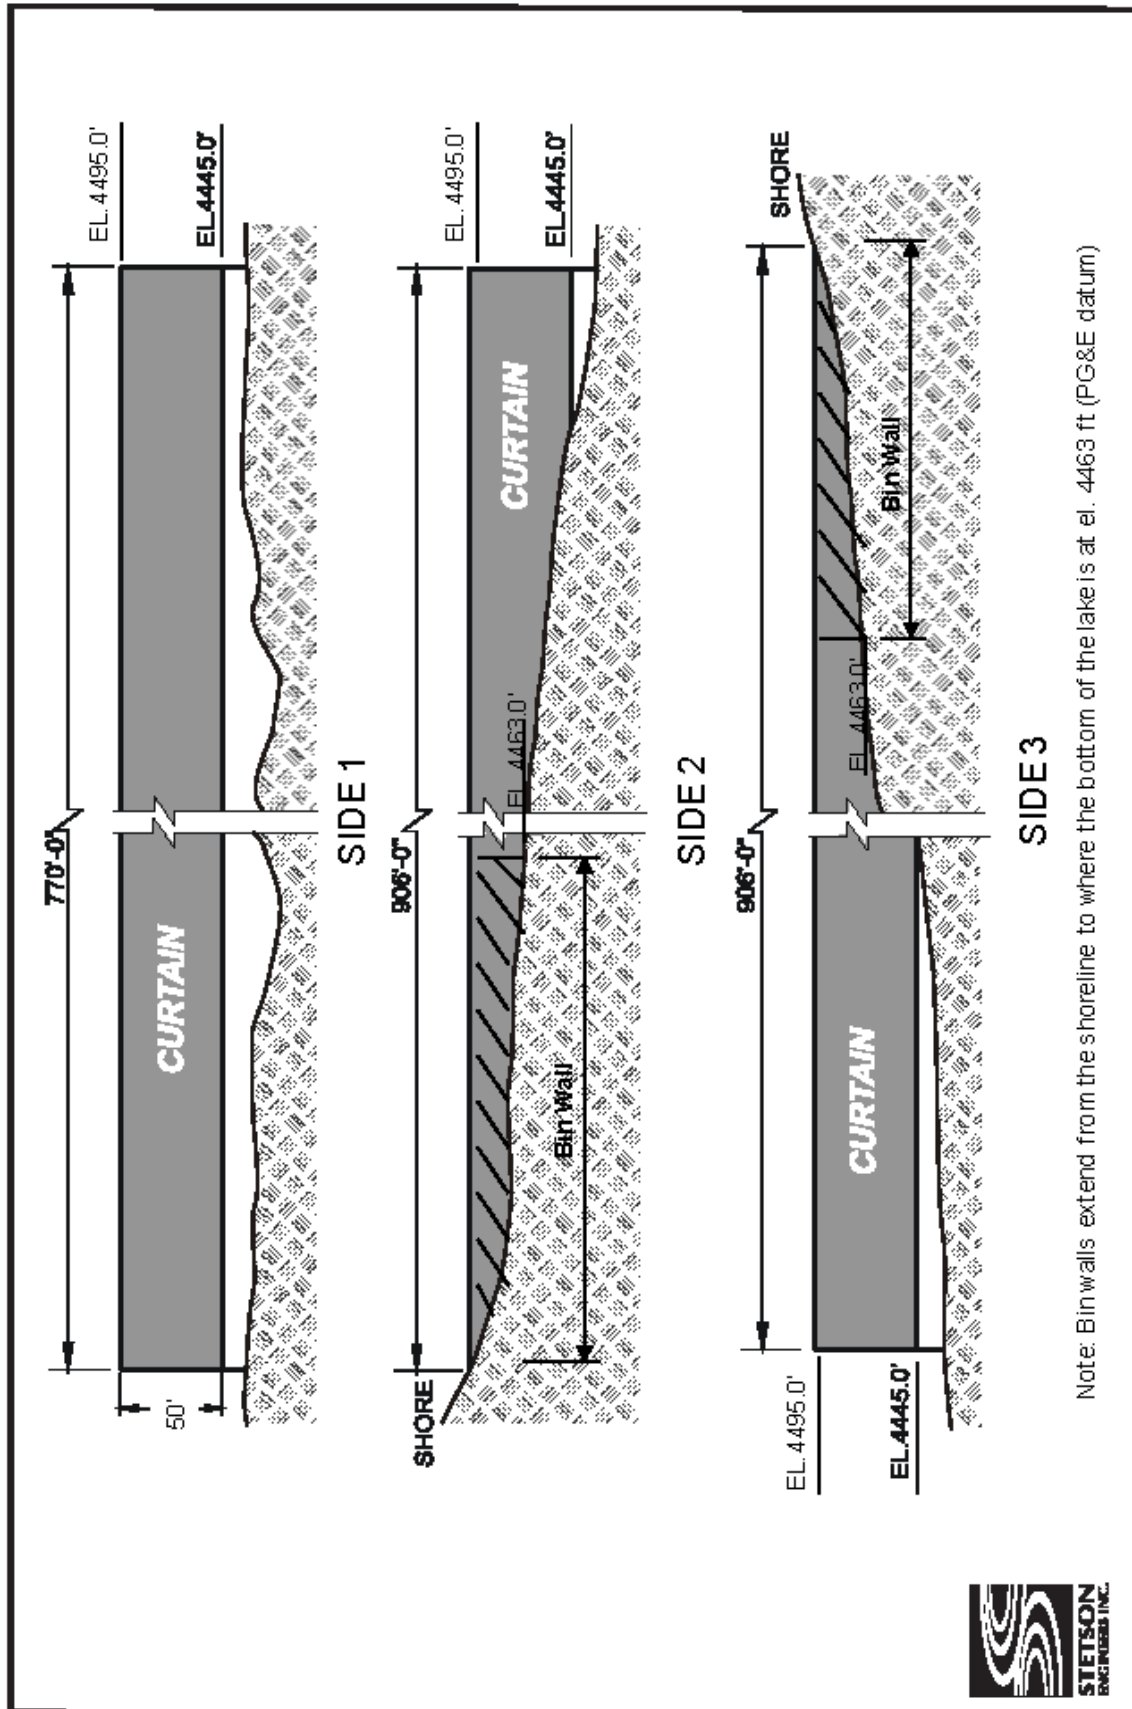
Elevation View of Prattville Intake Thermal Curtain
